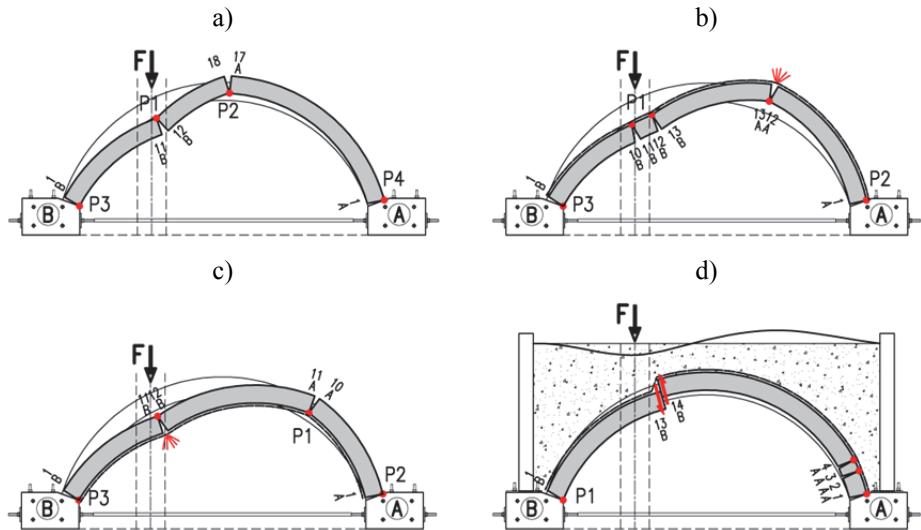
Failure mechanisms: a) specimen AU, b) specimen ASE, c) specimen ASI, d) specimen with backfill, strengthened at the extrados [9]
